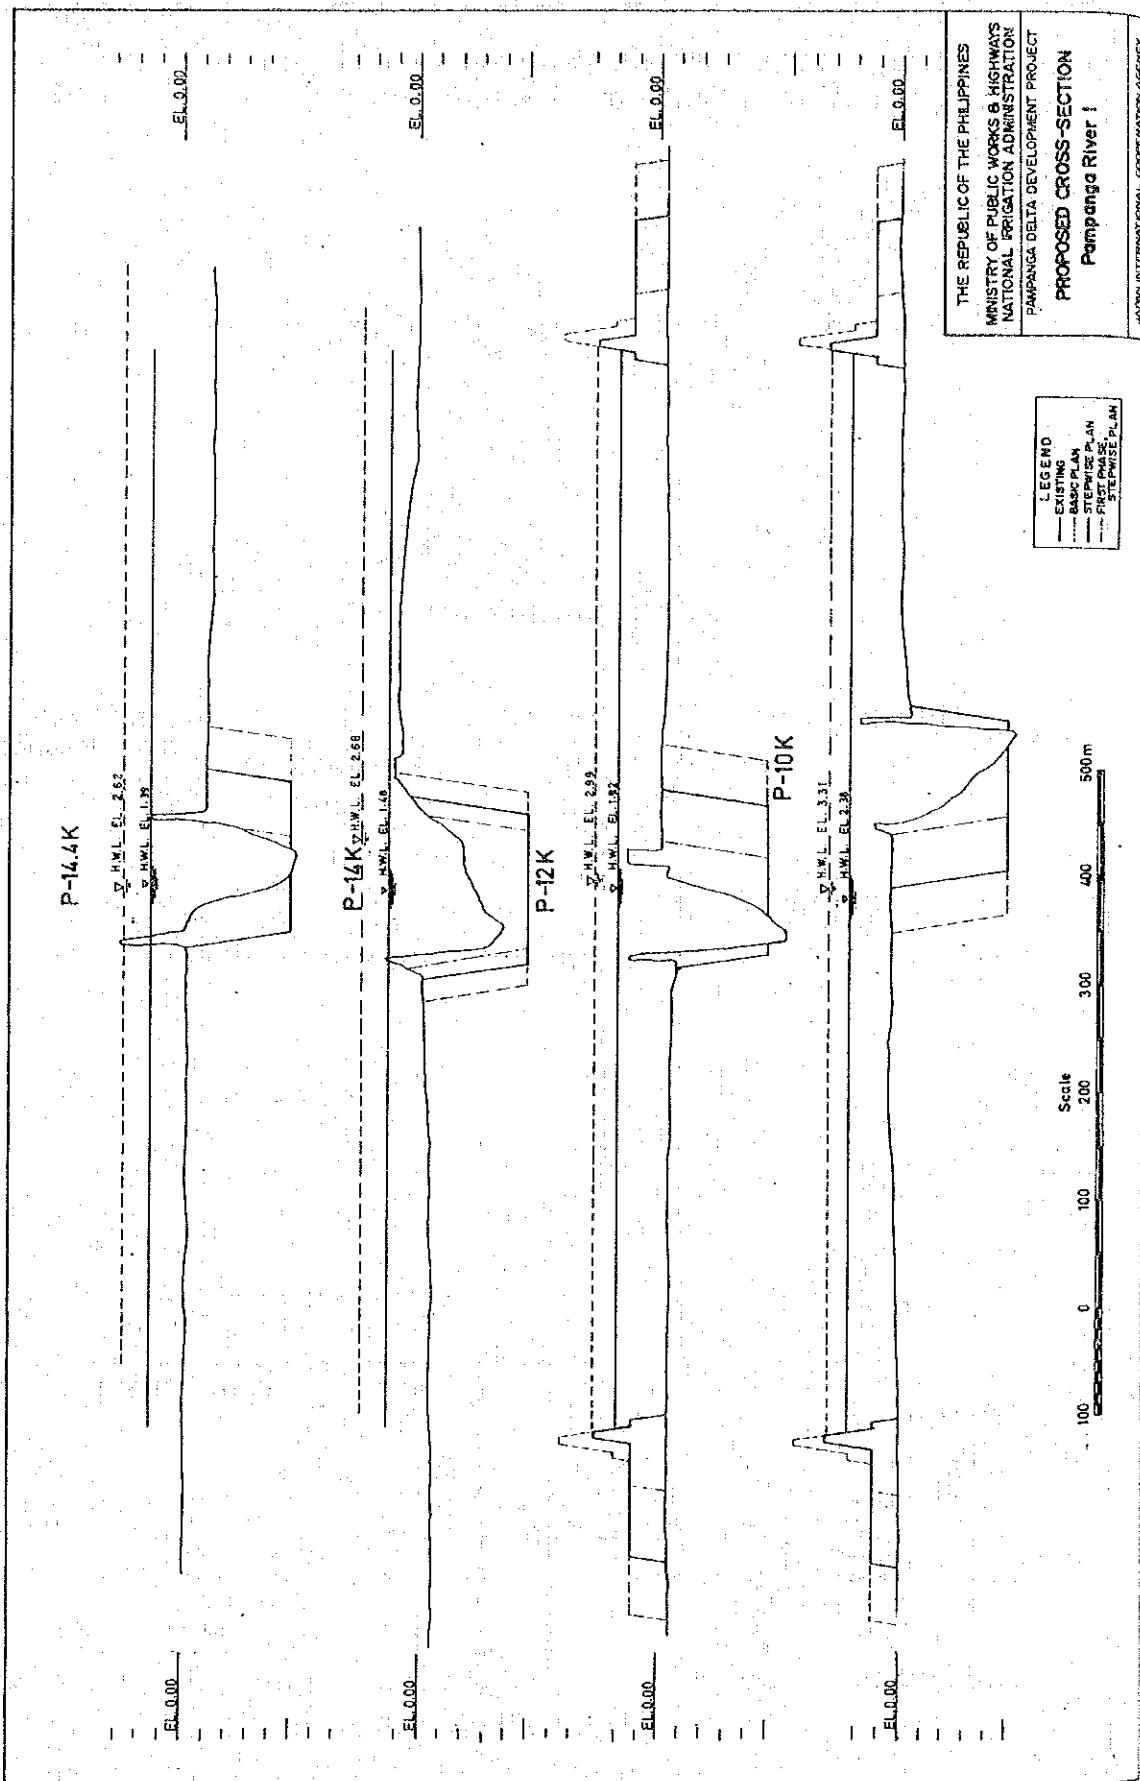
(2) PROPOSED CHANNEL CROSS-SECTION
